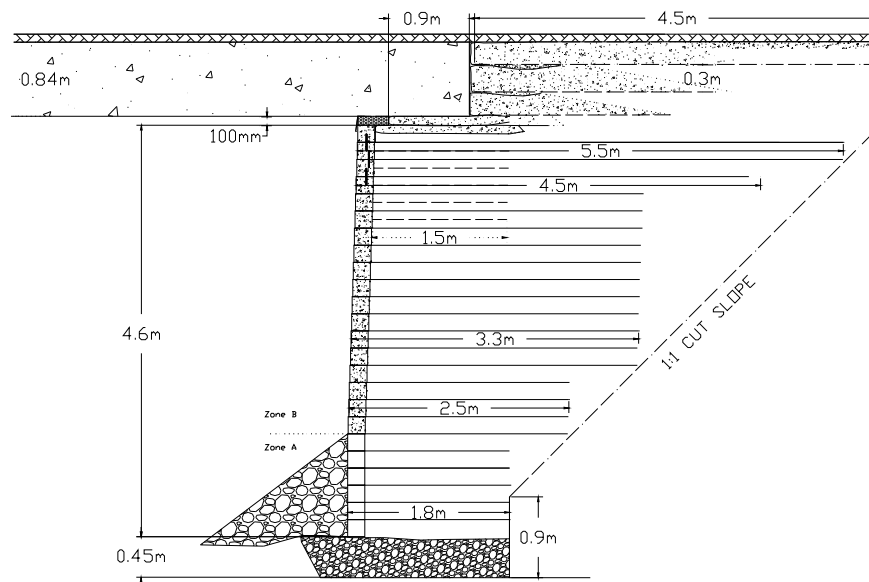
Reinforcement Schedule (Abutment and Approach Way)
